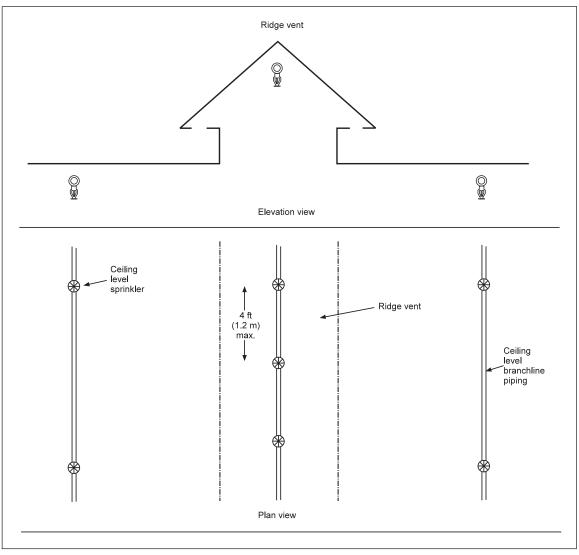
Quick-Response sprinklers installed under ceiling-level exhaust devices
